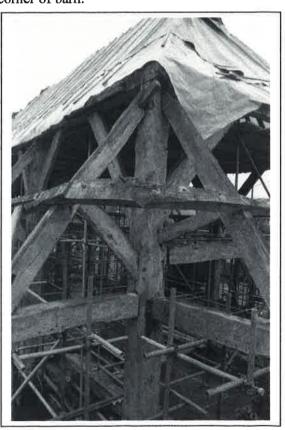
Southern aisle roof showing notches in upper face of aisle plate indicating former rafters
